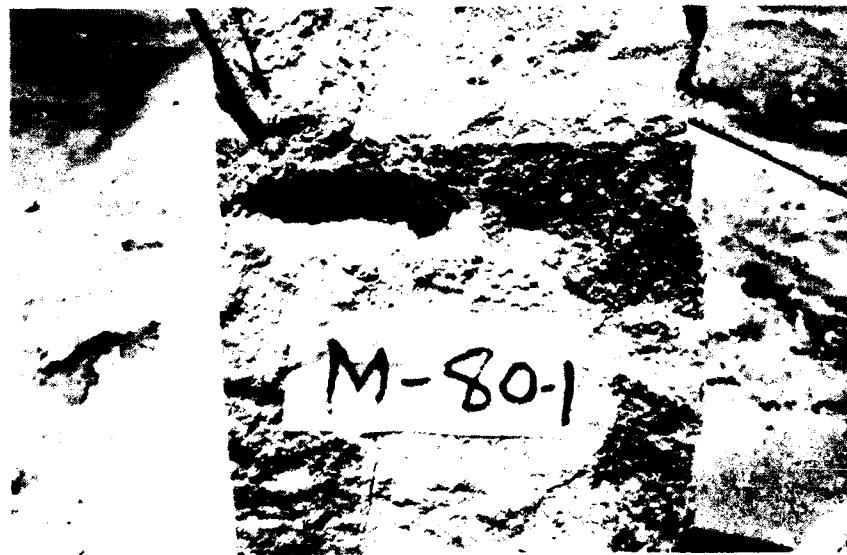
Deformation of 7.62m M80 lead core projectile on penetration of 8 in. grout-filled concrete masonry unit (CMU) wall
